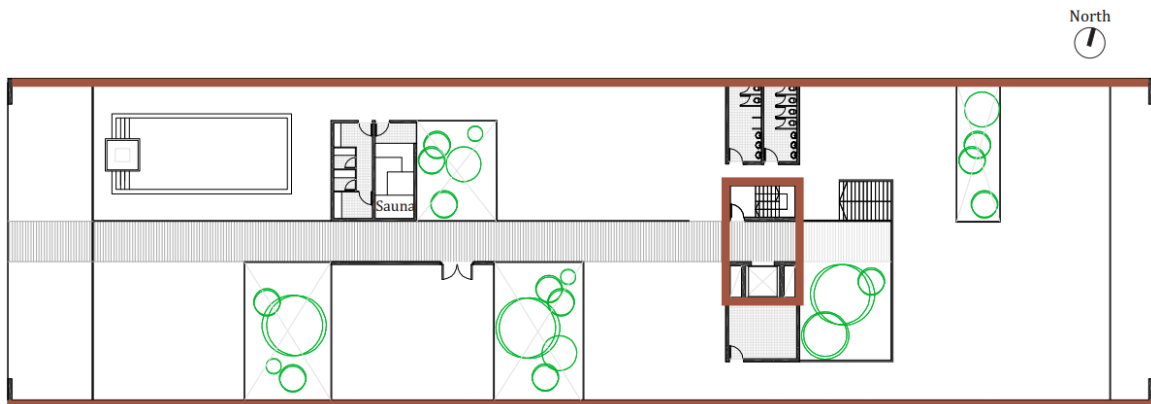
Structural Diagram - Second Floor. Main CLT elements are marked in brown.
